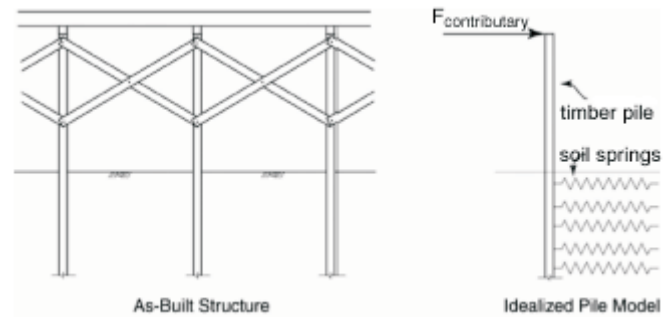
F-4-2—SIMPLIFIED SINGLE PILE MODEL OF A TIMBER PILE SUPPORTED STRUCTURE
